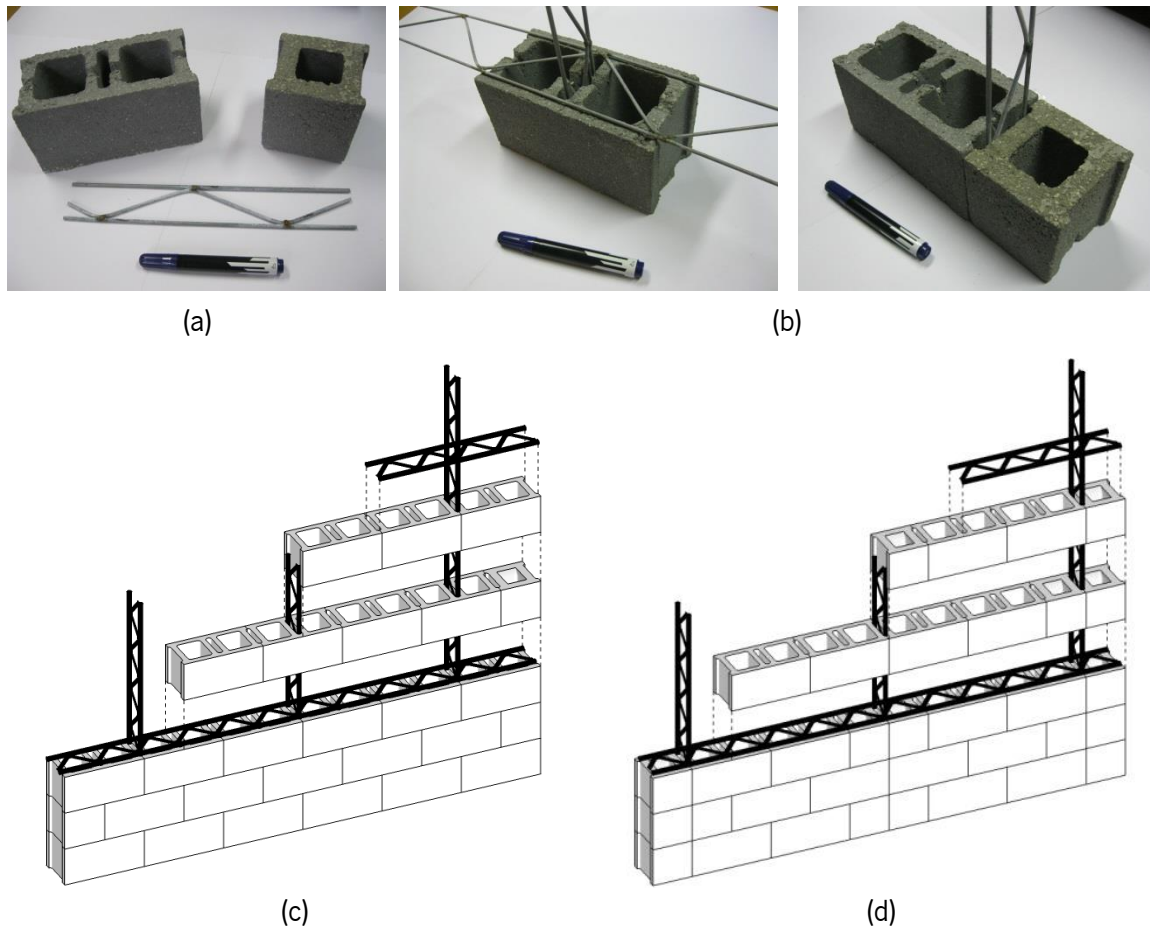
Details of the constructive system based on concrete block masonry: (a) unit block, half unit block and steel truss type reinforcement, (b) sample of block and reinforcement disposition, (c) traditional masonry bond with truss type reinforcement, (d) alternative masonry bond composed of continuous vertical joints formed by the frogged ends of the concrete blocks
